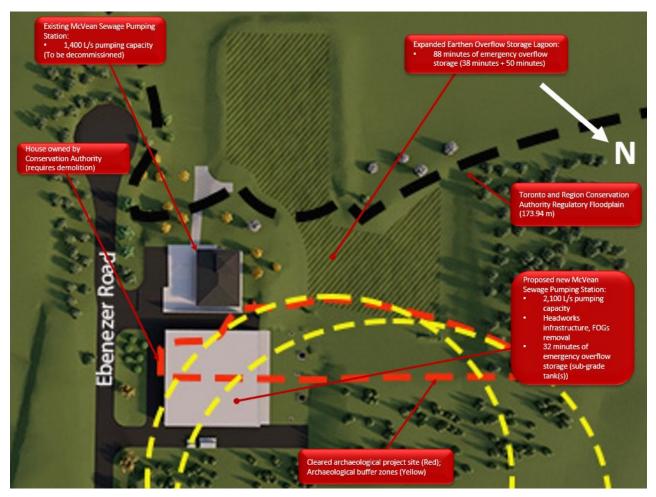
Alternative 2 Layout – New SPS and Expansion of Existing Earthen Emergency Overflow Lagoon
